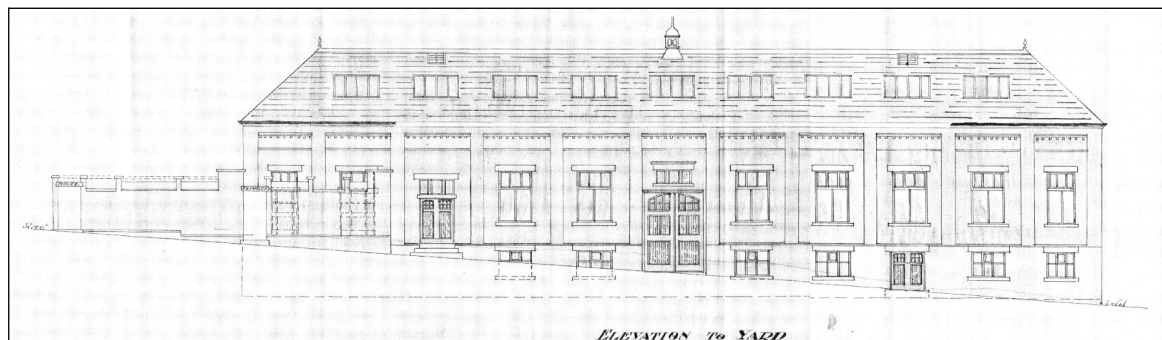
Detached weaving shed: north-east (warehouse) elevation, 1905
